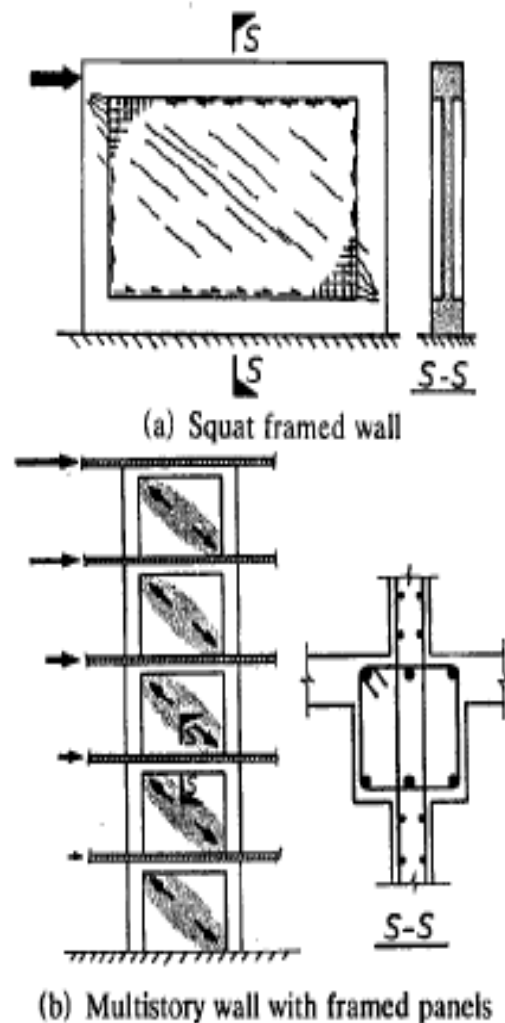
Framed structural walls (source: Paulay and Priestley, 1992)
